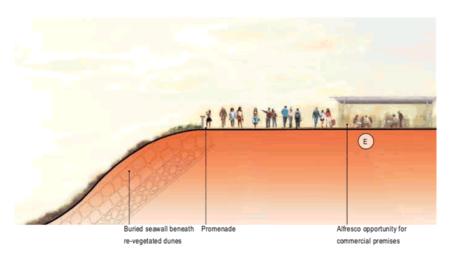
Typical Section showing High Crested Buried Revetment in Masterplan
